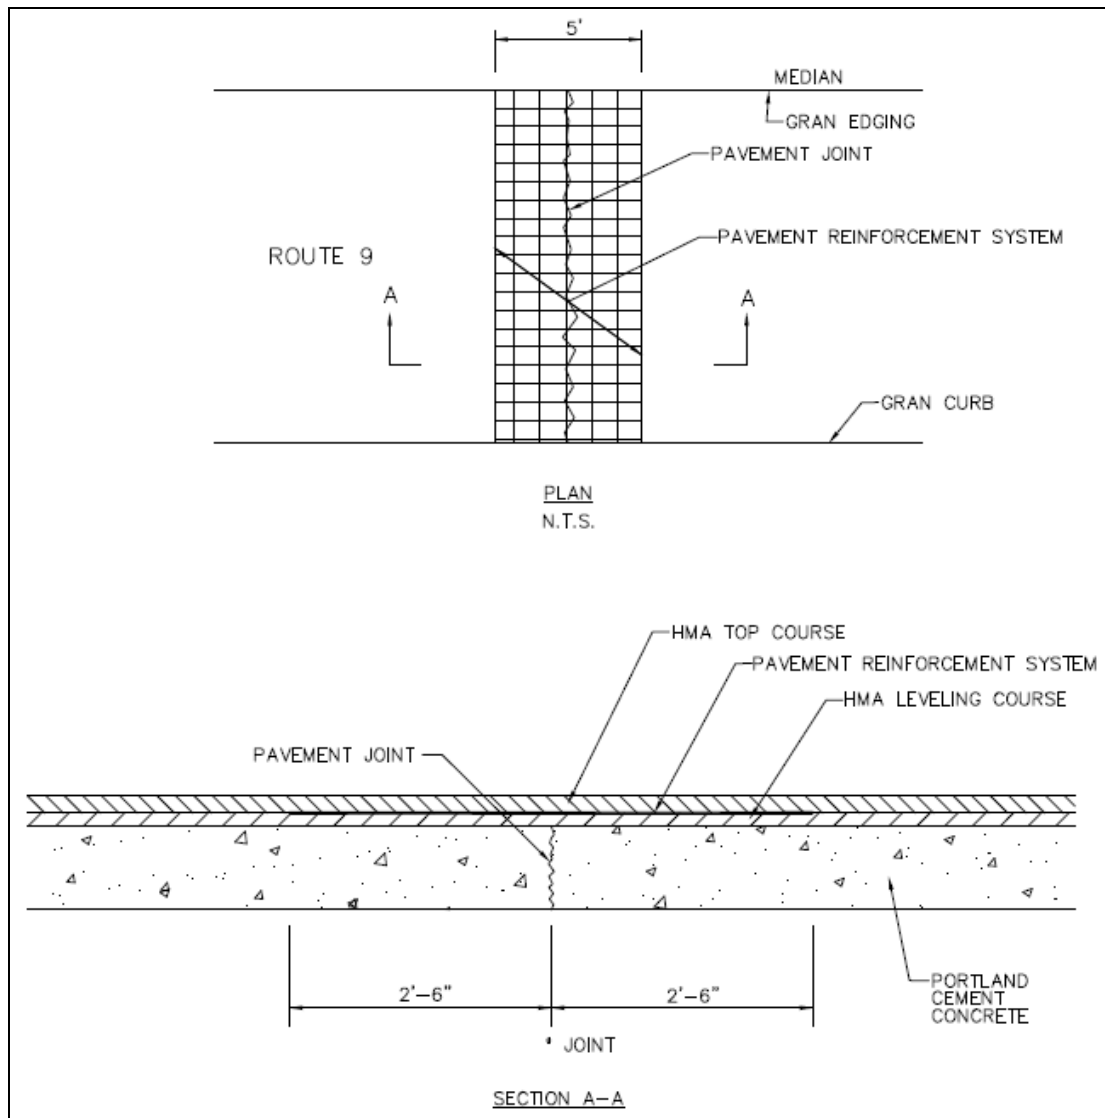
P4 typical section, Route 9 Framingham-Natick
